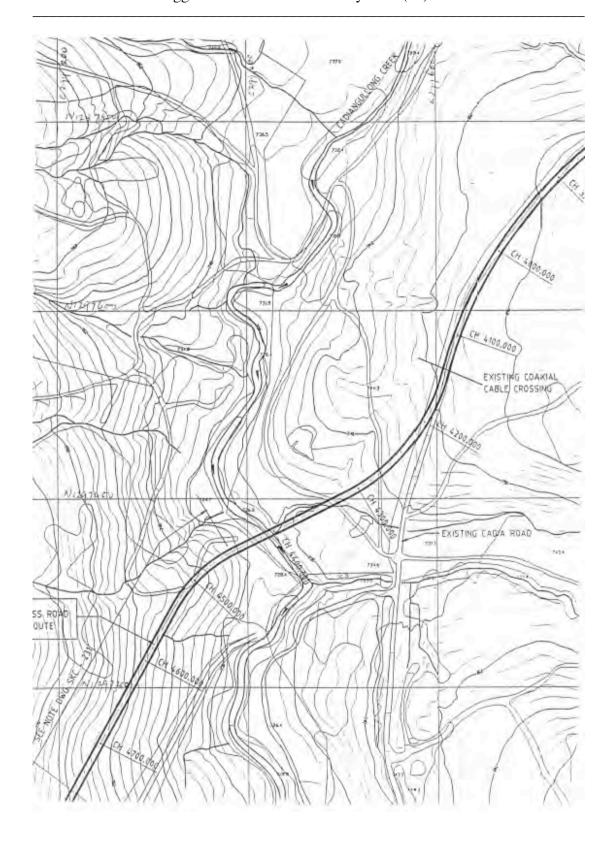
Plan showing the alignment of the proposed Mine Access Road through the East Cadia Village Site. The village extends from 3800 chains to 4500 chains, although most of the buildings were located on the east side of the existing road.
